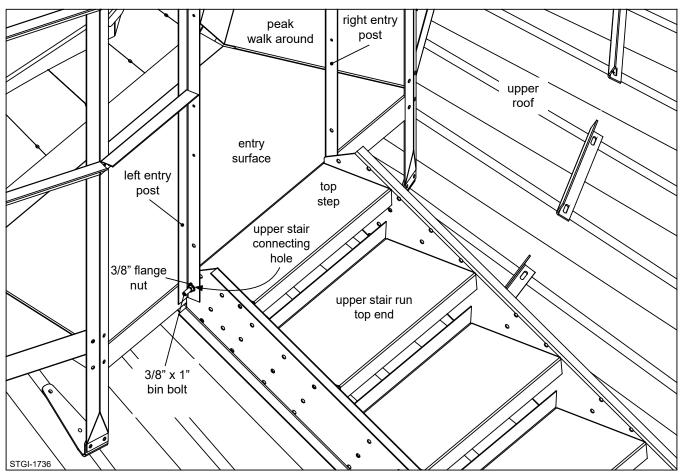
Upper Stair Run to the Peak Walk Around Completed Connection
